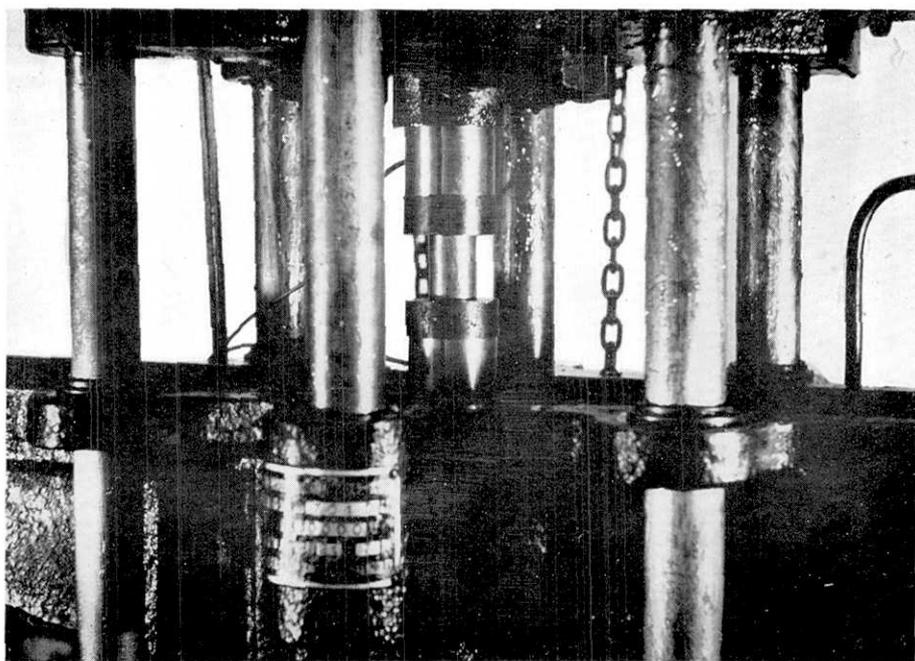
Close-up view of the specimen compressed by the hydraulic press.
